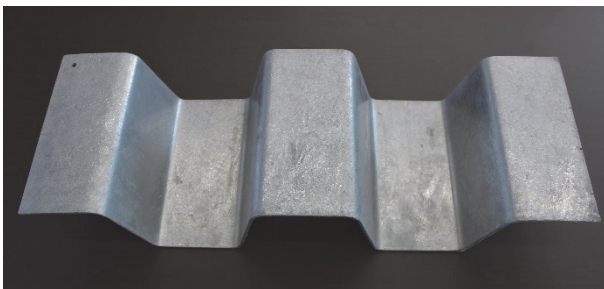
Plank sheet with a 2.7-mm thick, 100-mm high and 570-mm wide steel plate
